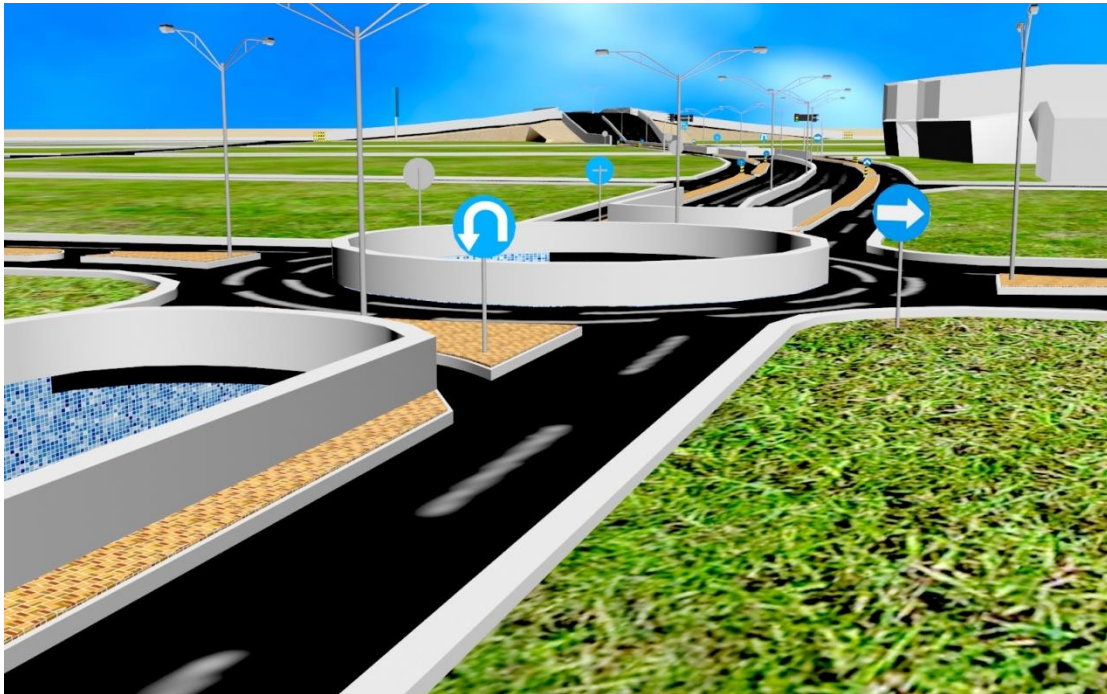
(a). View of the tunnel/roundabout (view #1)
